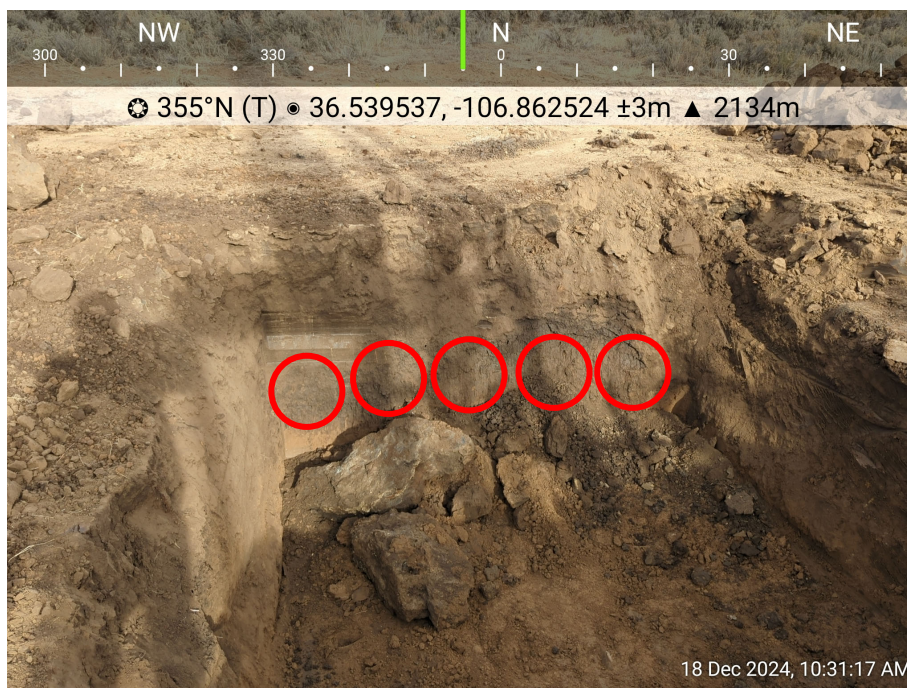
SS05 collected as a 5-point composite sample from the north sidewall of wellhead excavation area.
